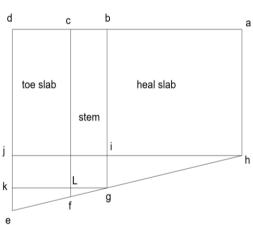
Cantilever retaining wall (Stability calculation Top view)
